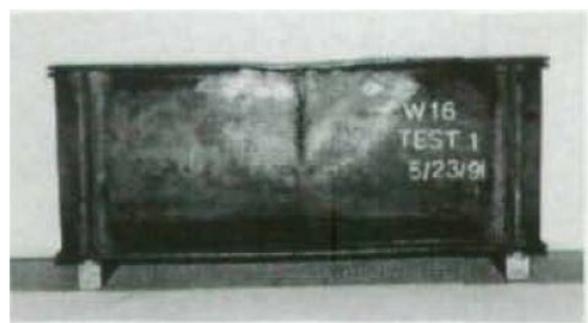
Failure mode 2—local stiffener crippling (test 1).
